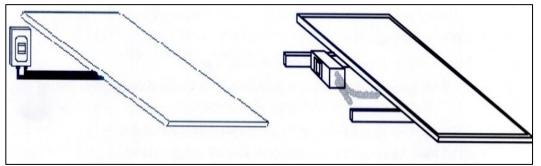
Recommended Roof Mounted Isolator mounting arrangement
